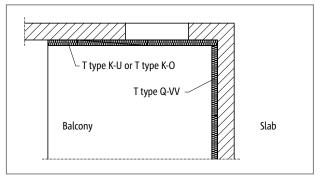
Schöck Isokorb® T type K-U/K-O, T type Q-VV: Balcony with inside corner, double-faced supported
